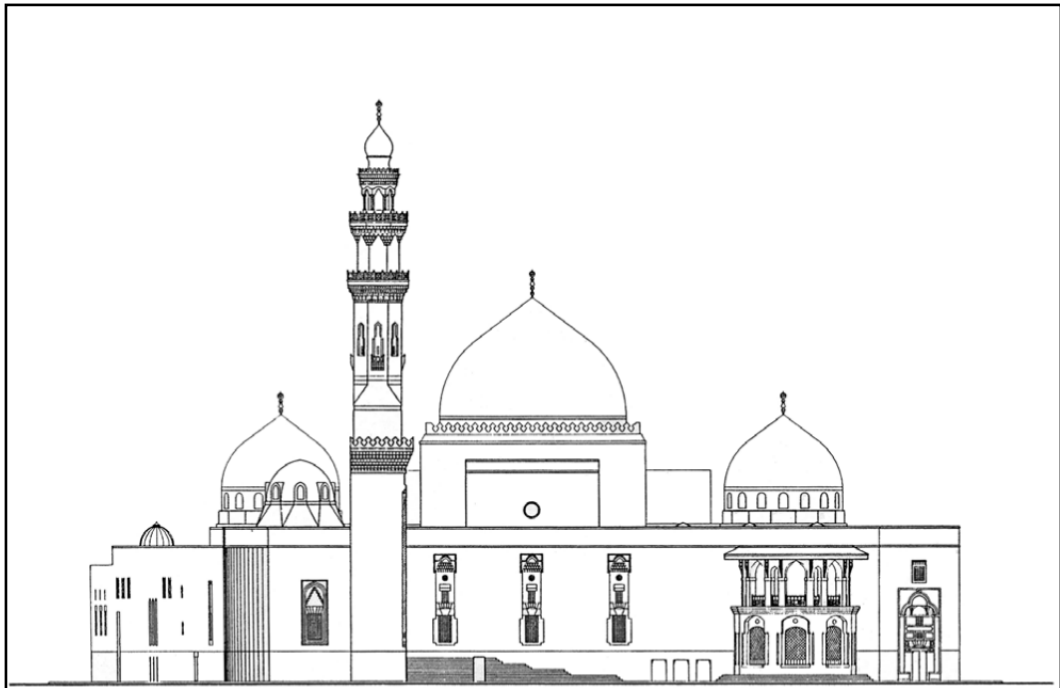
King Saud Mosque: West Elevation (El-Wakil, 1988).
